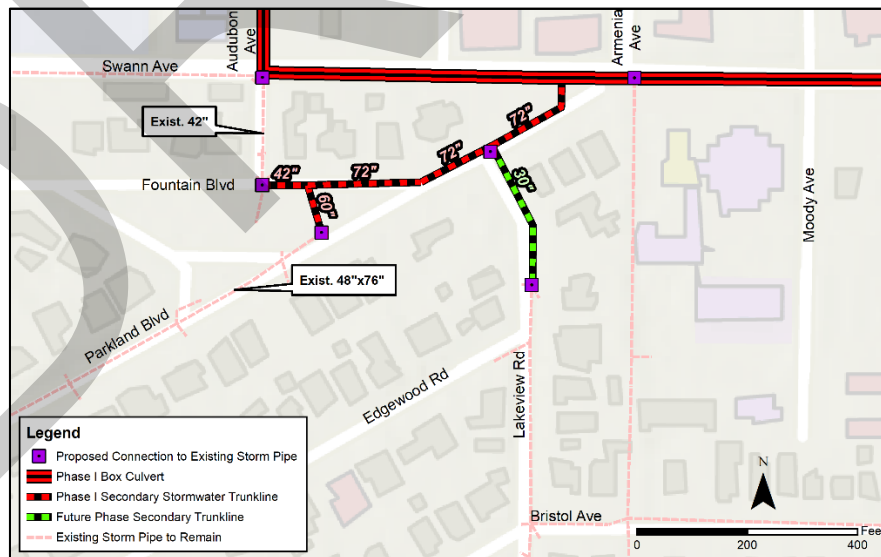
Parkland Estates Proposed Stormwater Connections (W Swann Ave Route)
